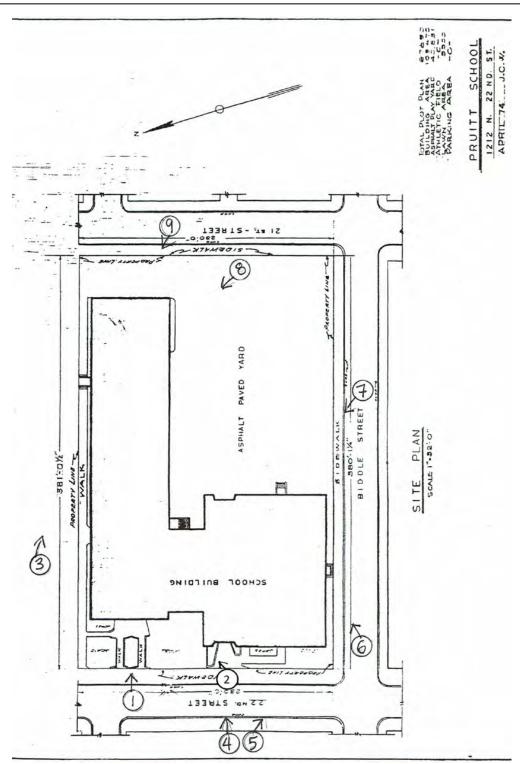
Exterior plan and photo map (Plan courtesy of KIPP Inspire Academy).
